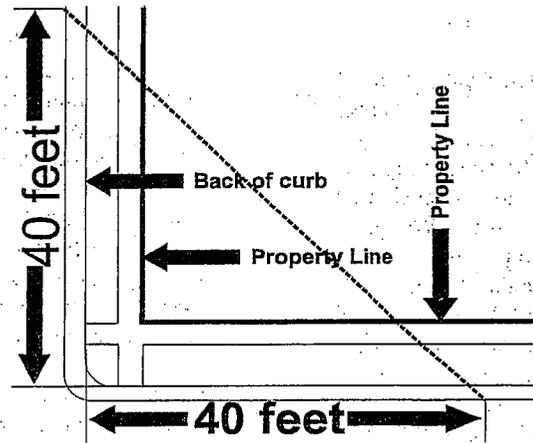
Clearview of intersecting roads, 40 foot clearview zone with sidewalk, curb and gutter.
